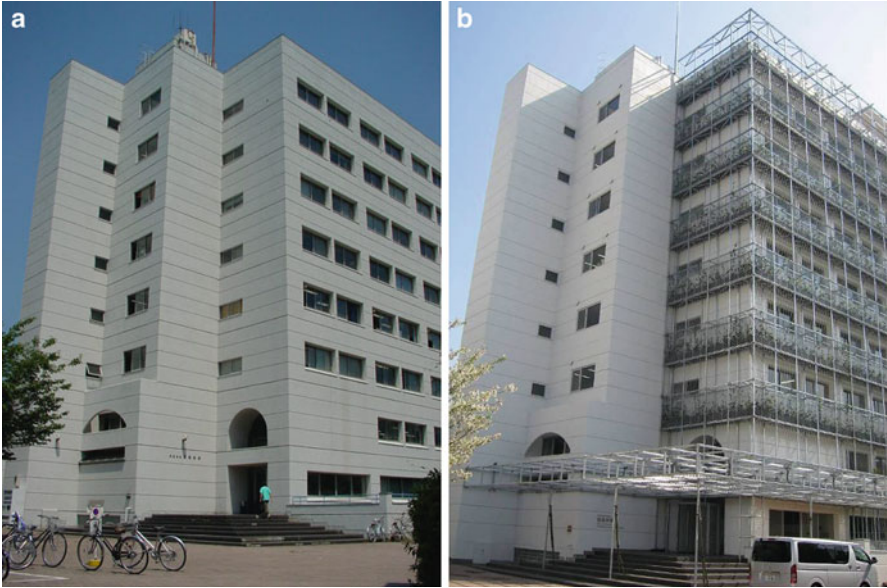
Instrumented building (a) Before retrofitting (b) After retrofitting
